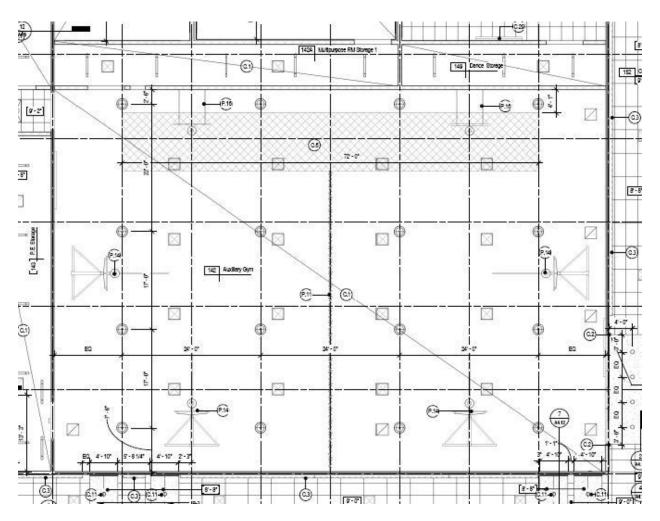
Reflected Ceiling Plan Auxiliary Gym
